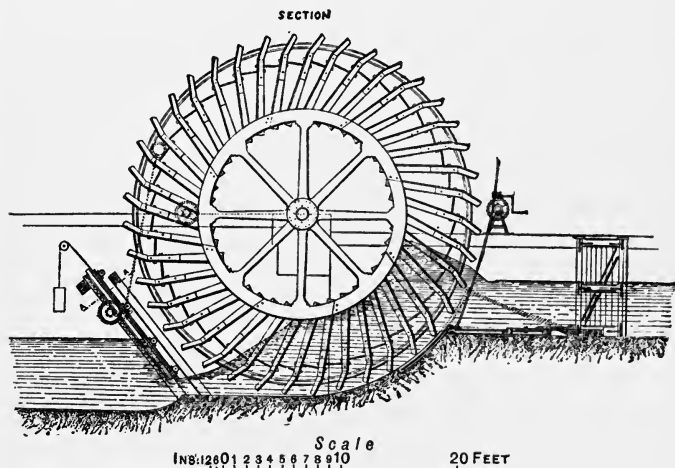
Scoop Wheel with Shuttle and Movable Breast.
